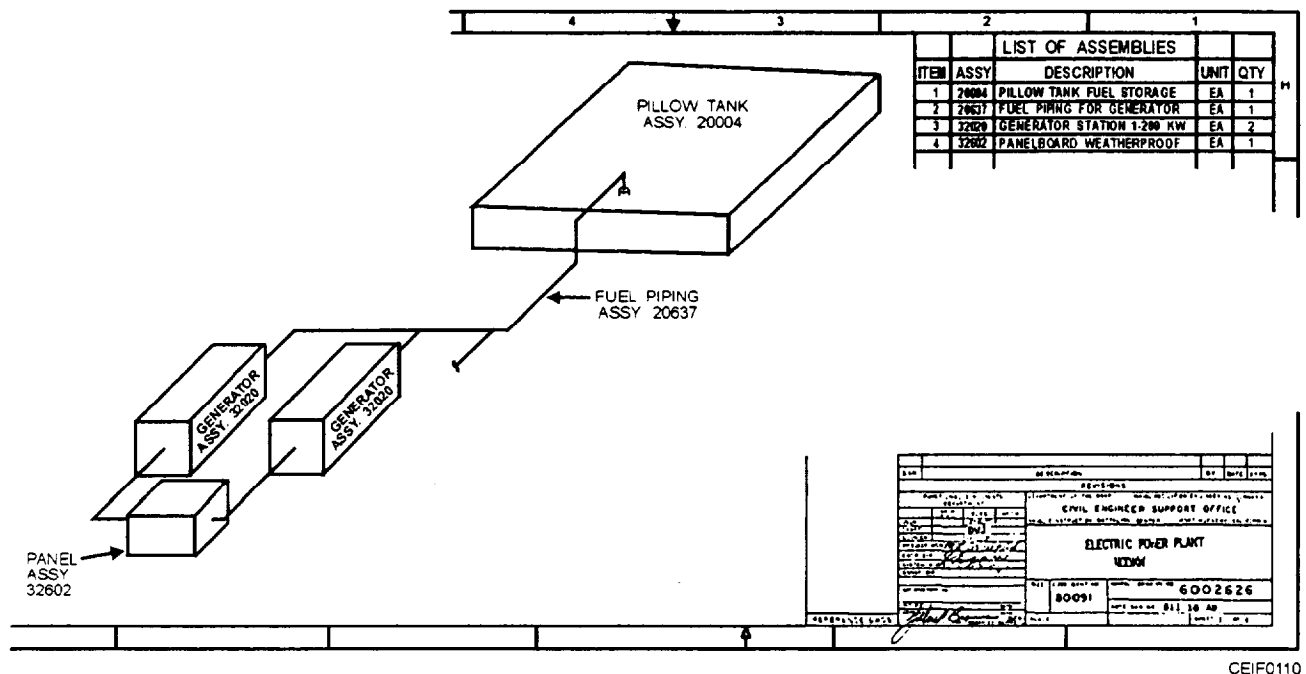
Layout drawing for a 400-kilowatt electrical power plant.
